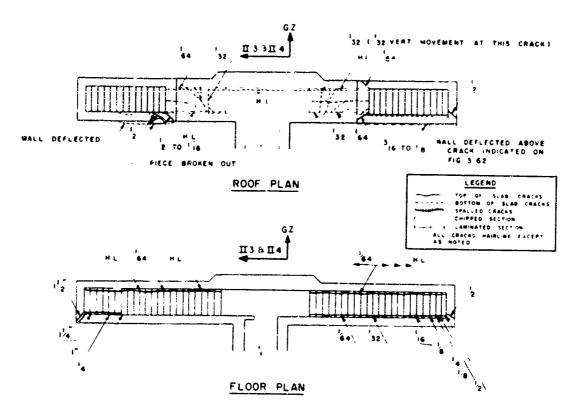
Entrance crack pattern, structure II-5.
